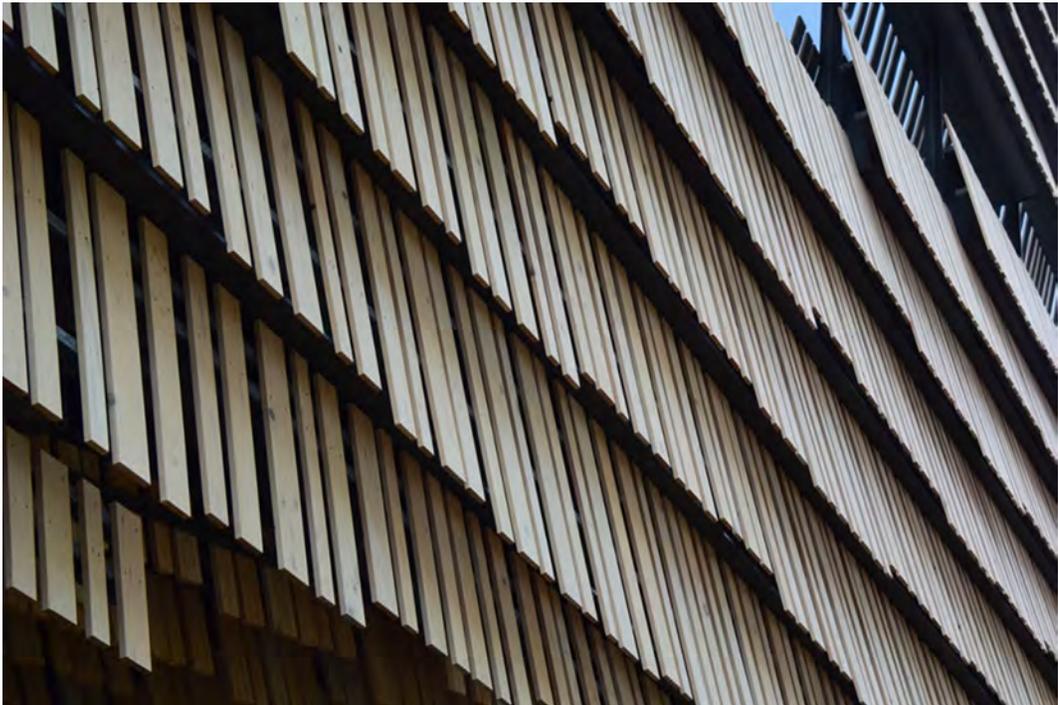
and 4. Conservatoire Darius Milhaud, exterior façade details (photographs: author, 2014)
